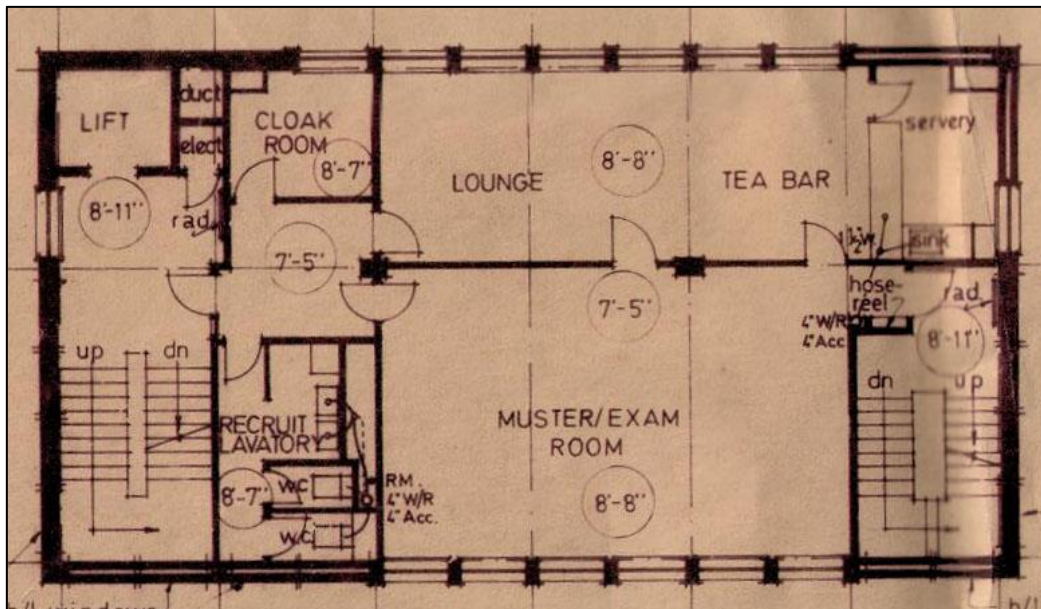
A 1984 fourth floor plan of the eight-storey tower block demonstrating the plan without the central corridor (Chief Engineer's Office, Metropolitan Police)
